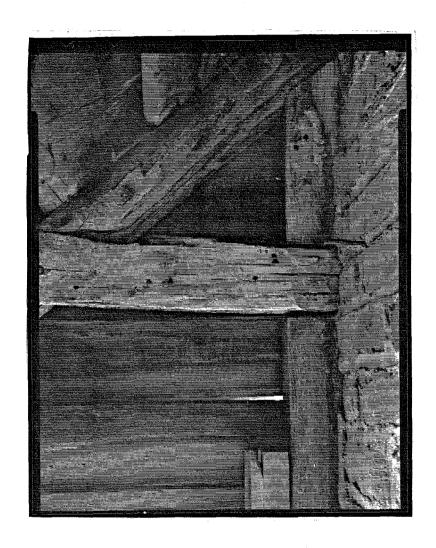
Hermitage Quarter, detail of collar beam and chimney stack in south gable end of attic, looking south.
